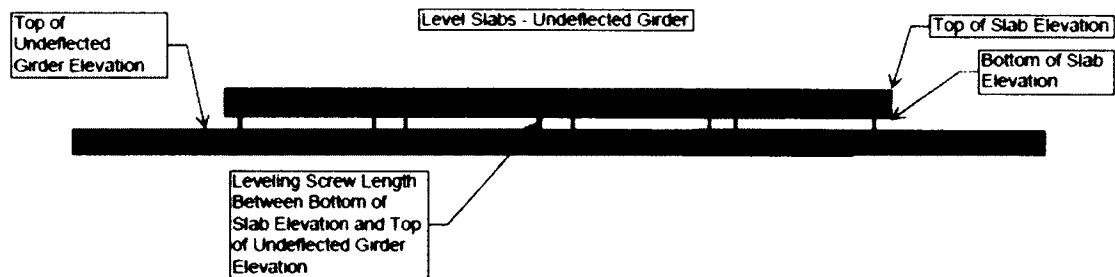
Level Bridge Deck Undeflected Girder Leveling Screw Length
